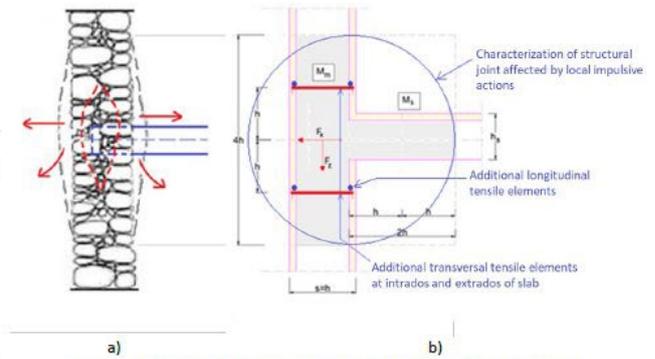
Impulsive actions on floor-to-wall joint: (a) sketch of the collapse mechanism; (b) reinforcement through additional tensile elements
